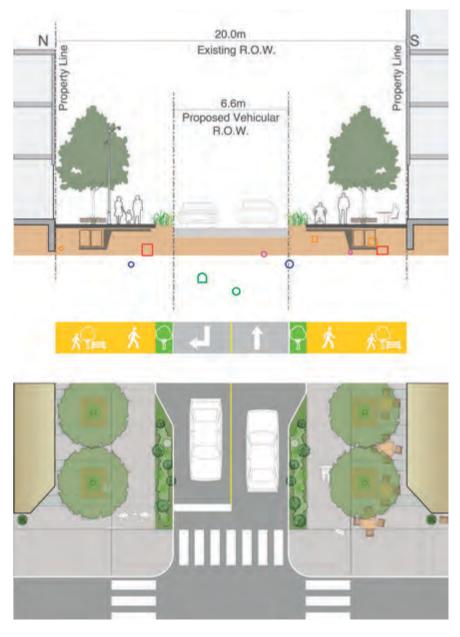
Section and Plan of Erskine Greenway - Recommended Final Condition at mid-block raised crossing bump-out
